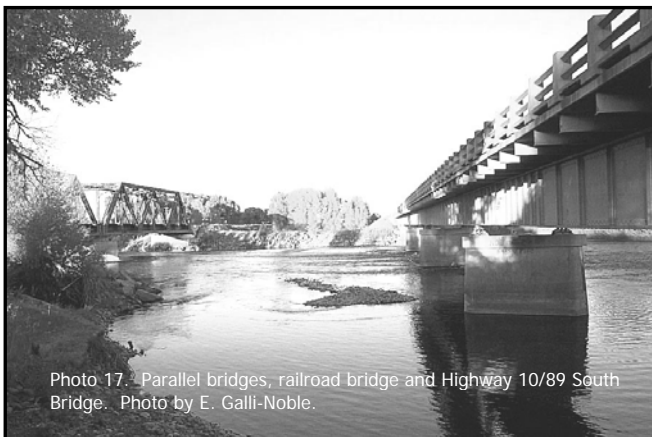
Parallel bridges, railroad bridge and Highway 10/89 South Bridge. Photo by E. Galli-Noble.
